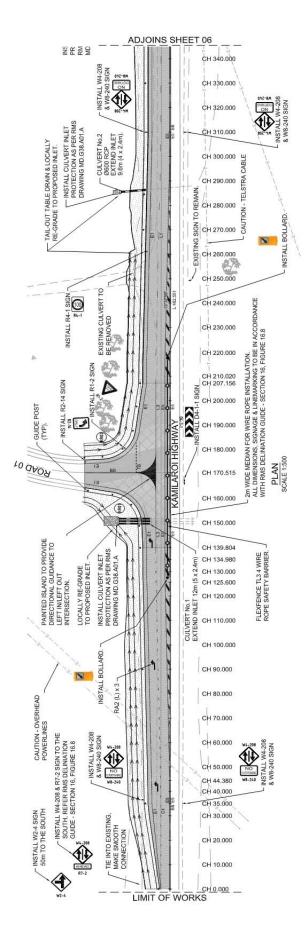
Proposed Kamilaroi Highway Intersection (North)
